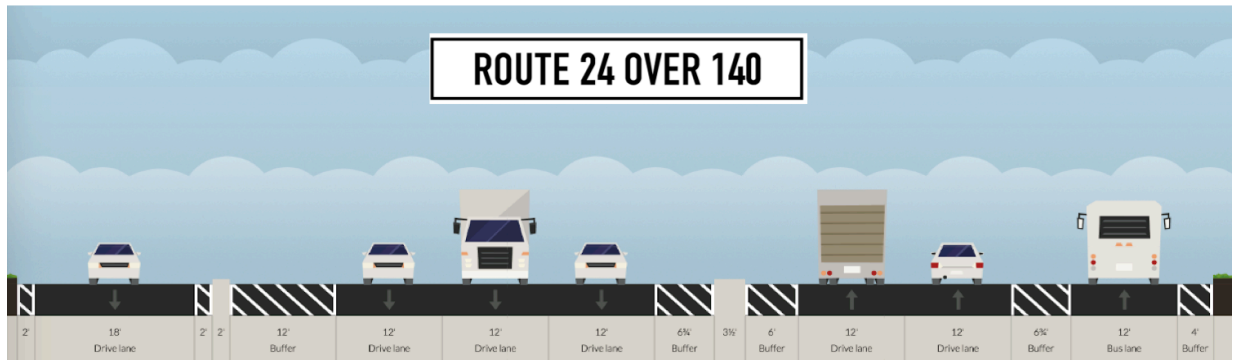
Proposed Route 24 bridge cross-section over Route 140 (Version 2, StreetMix 2017).
